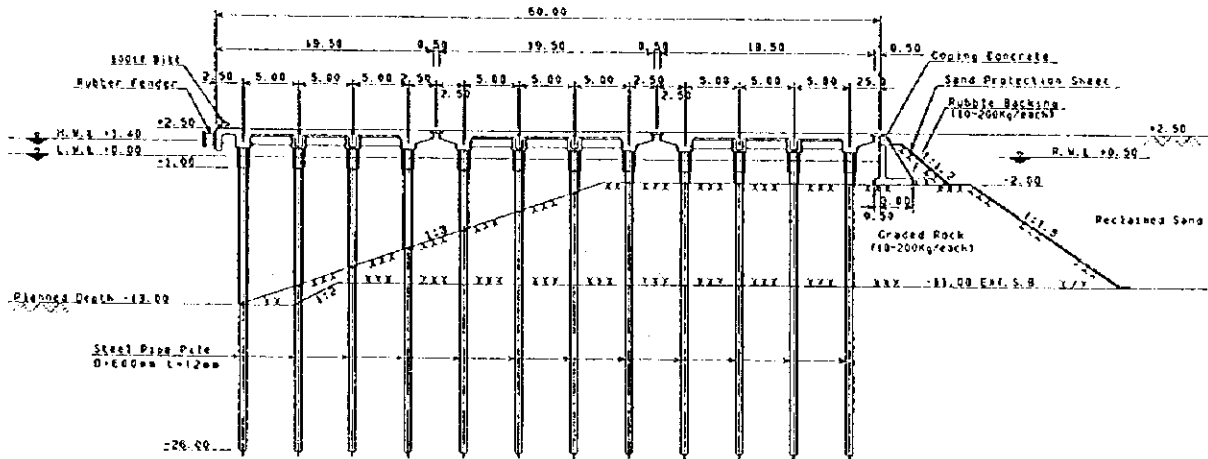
(1) Typical Cross Section of Quaywall W2 (Open Pier with Retaining Wall)
